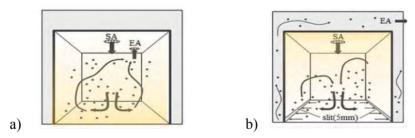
Two ventilation system. a) ceiling exhaust, b) slit exhaust
